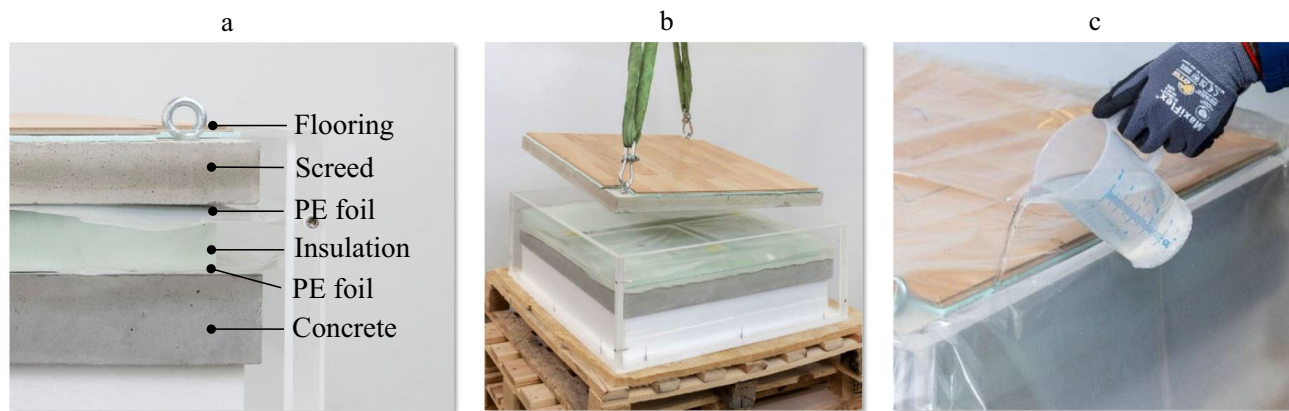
Modular test specimen with screed, insulation, and concrete base layer (a, b) and the simulation of an insulation damage by adding water to the setup (c) [27]
